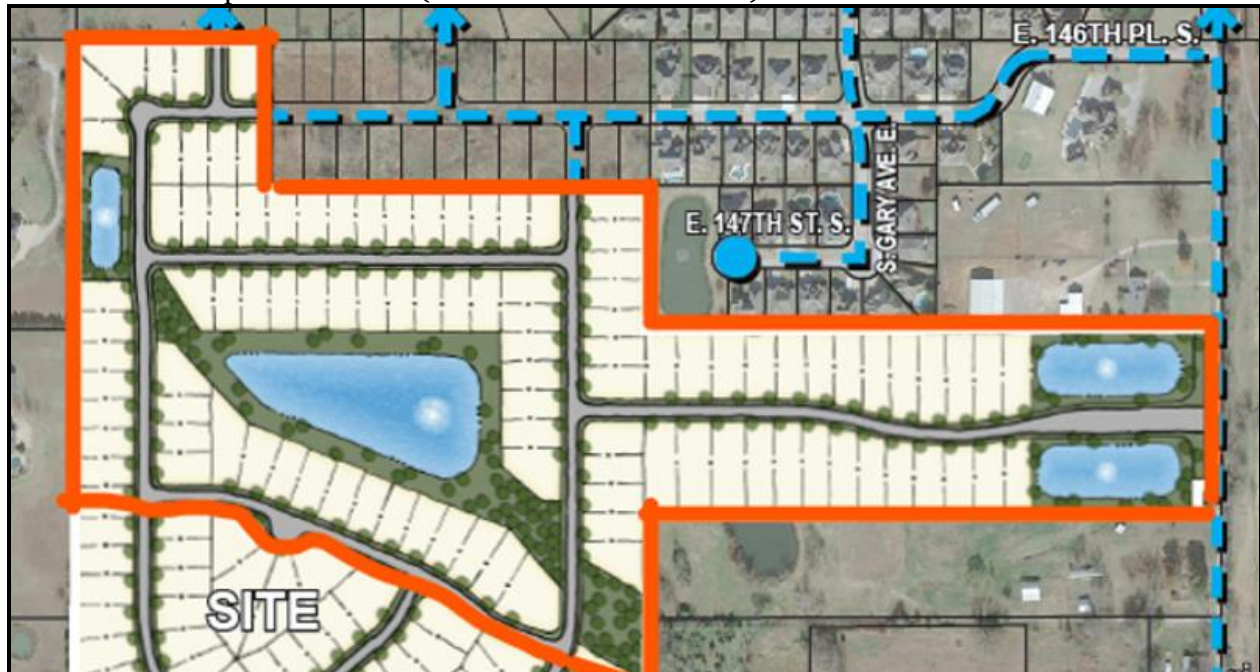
Exhibit B: Conceptual Site Plan (Outlined with Blocks 1-8)
